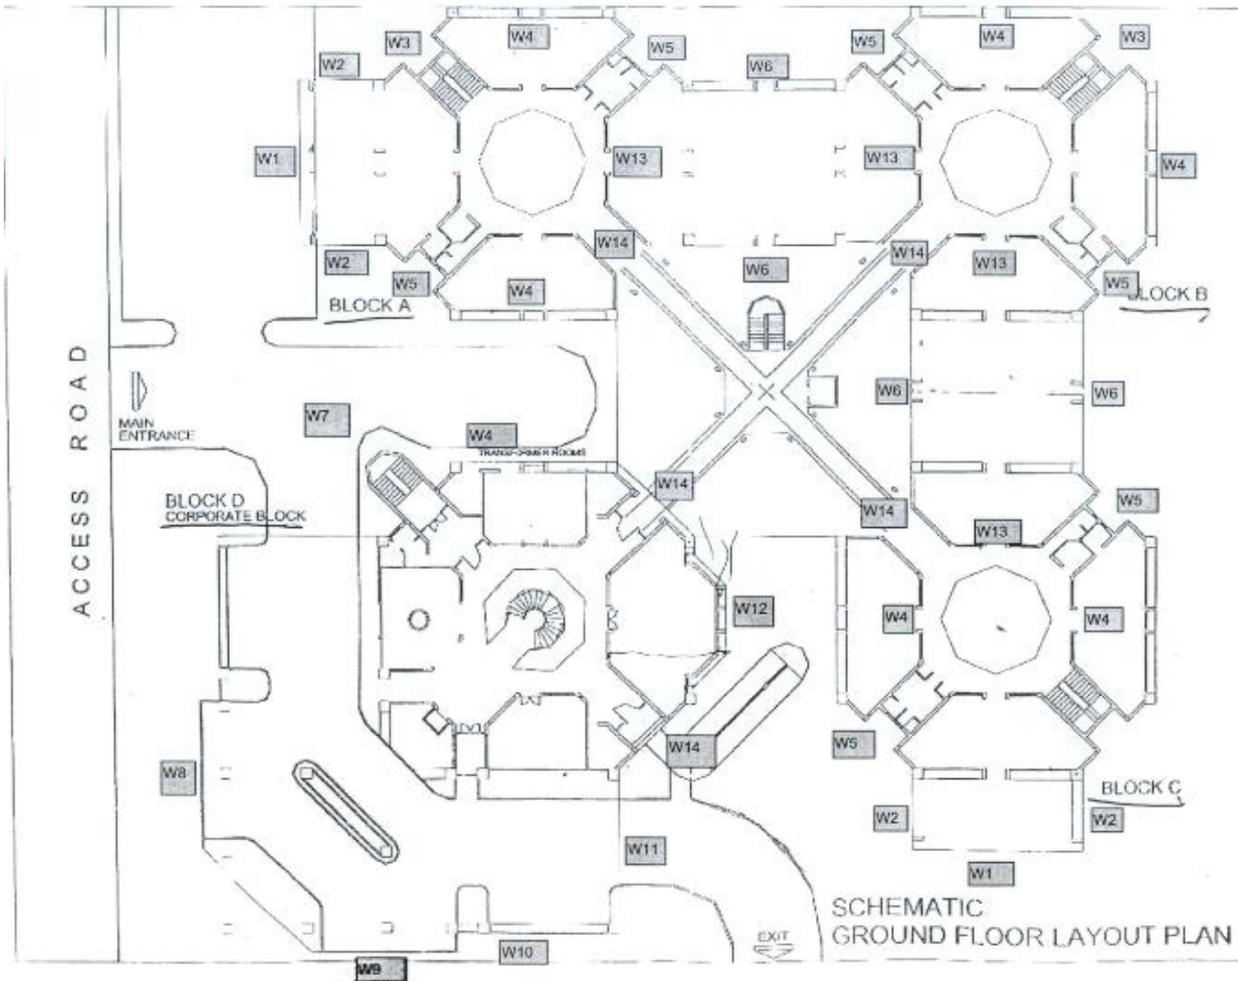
Layout of the Wapcos Ltd. corporate office building.
